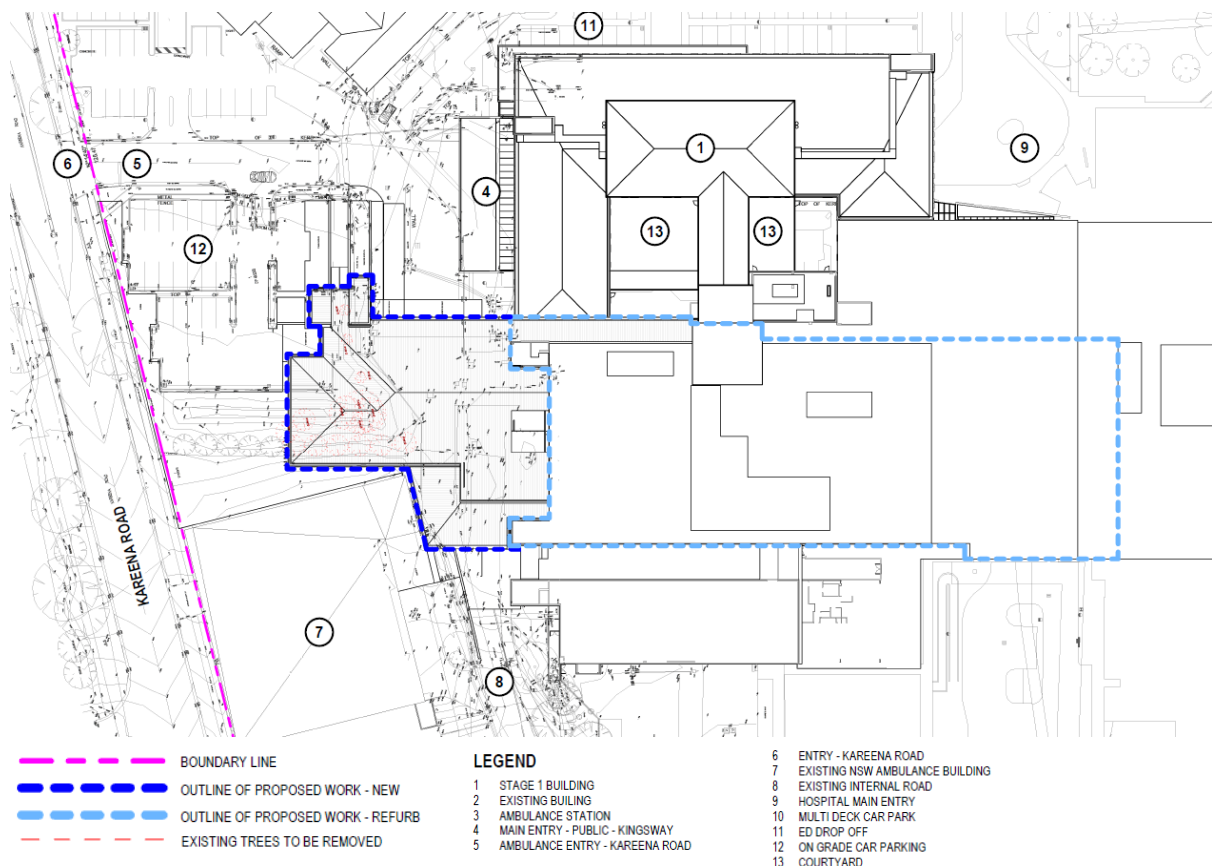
Indicative site plan extract. The indicative extent of the proposed extension is shown in dark blue dash; indicative location of alterations to existing hospital shown in light blue dash. Outer site boundary line shown in pink dash.
